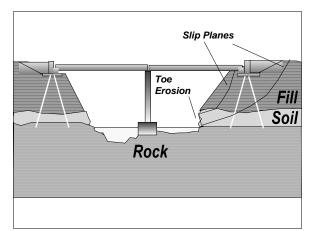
Unstable bridge approach embankment created by toe erosion, or scour.
